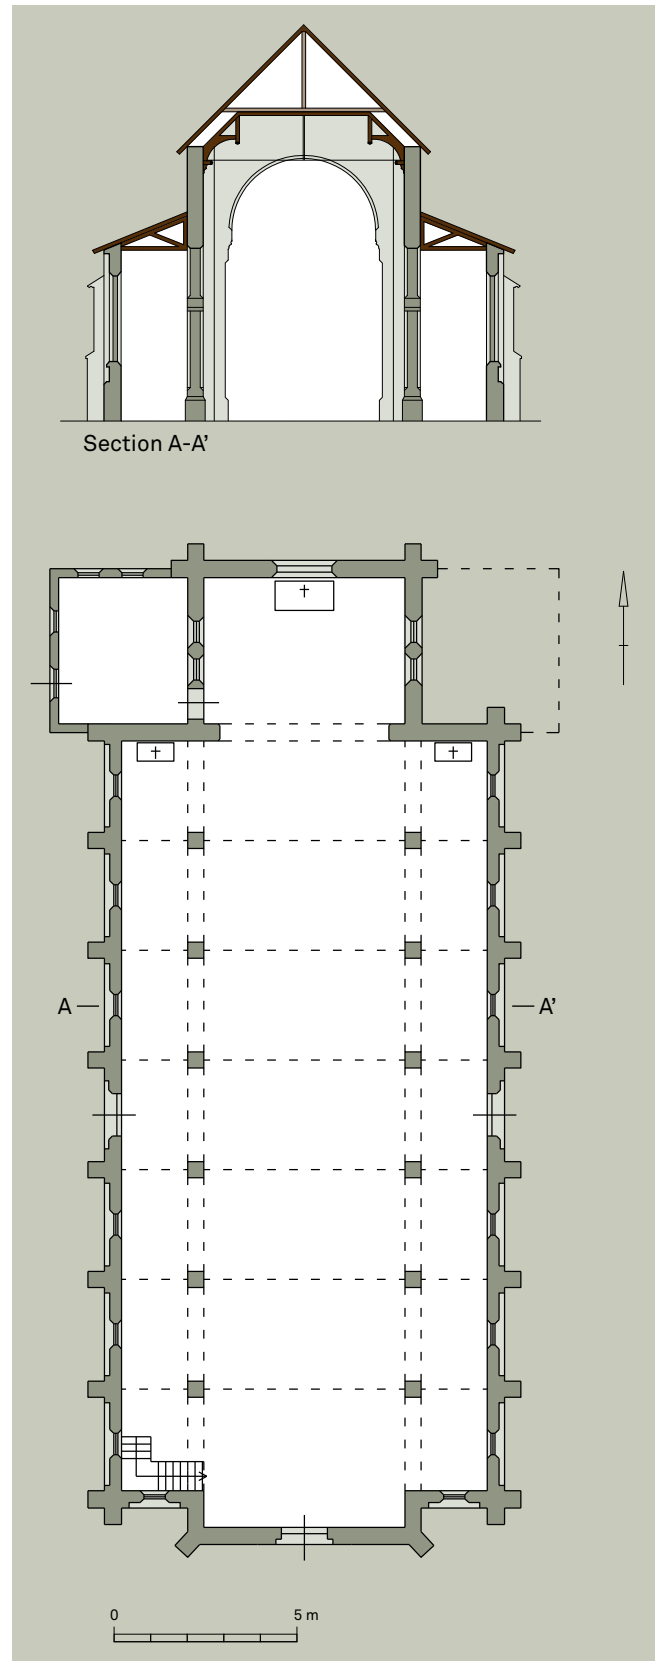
Church of Shebiya, plan and cross-section (measurement, © authors 2011).
